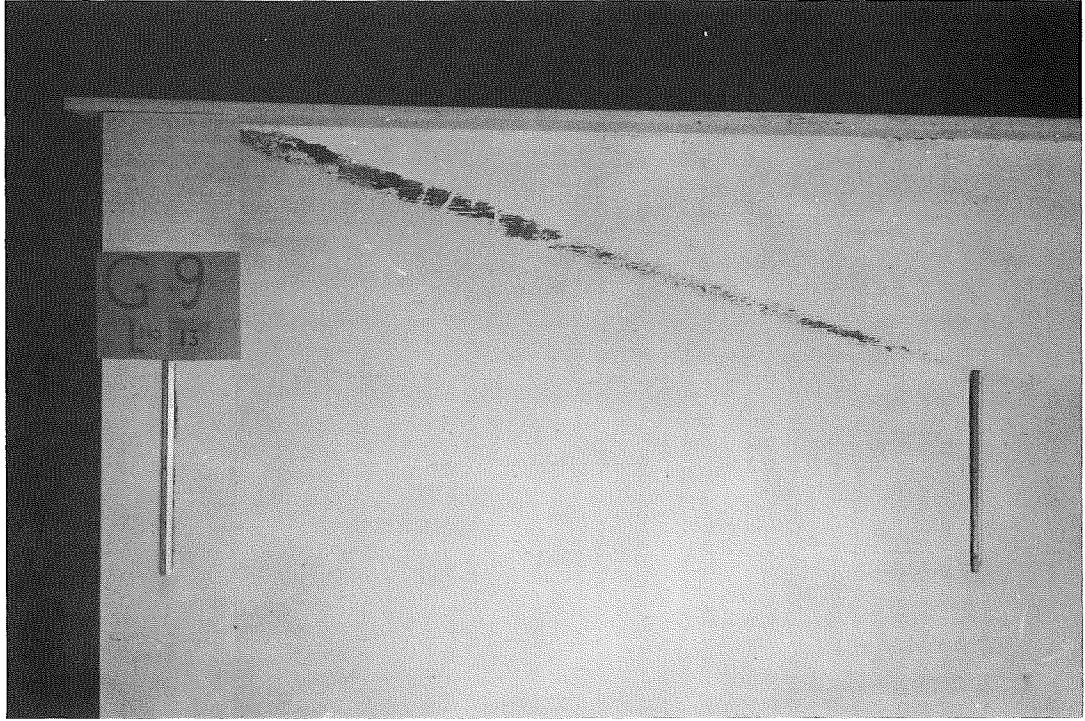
Failure of Girder G9 in Test T1
